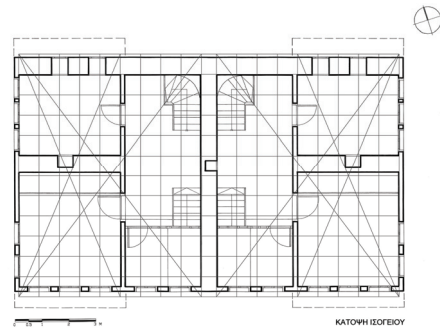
Ground floor plan of Anthopoulos Mansion in Florina
